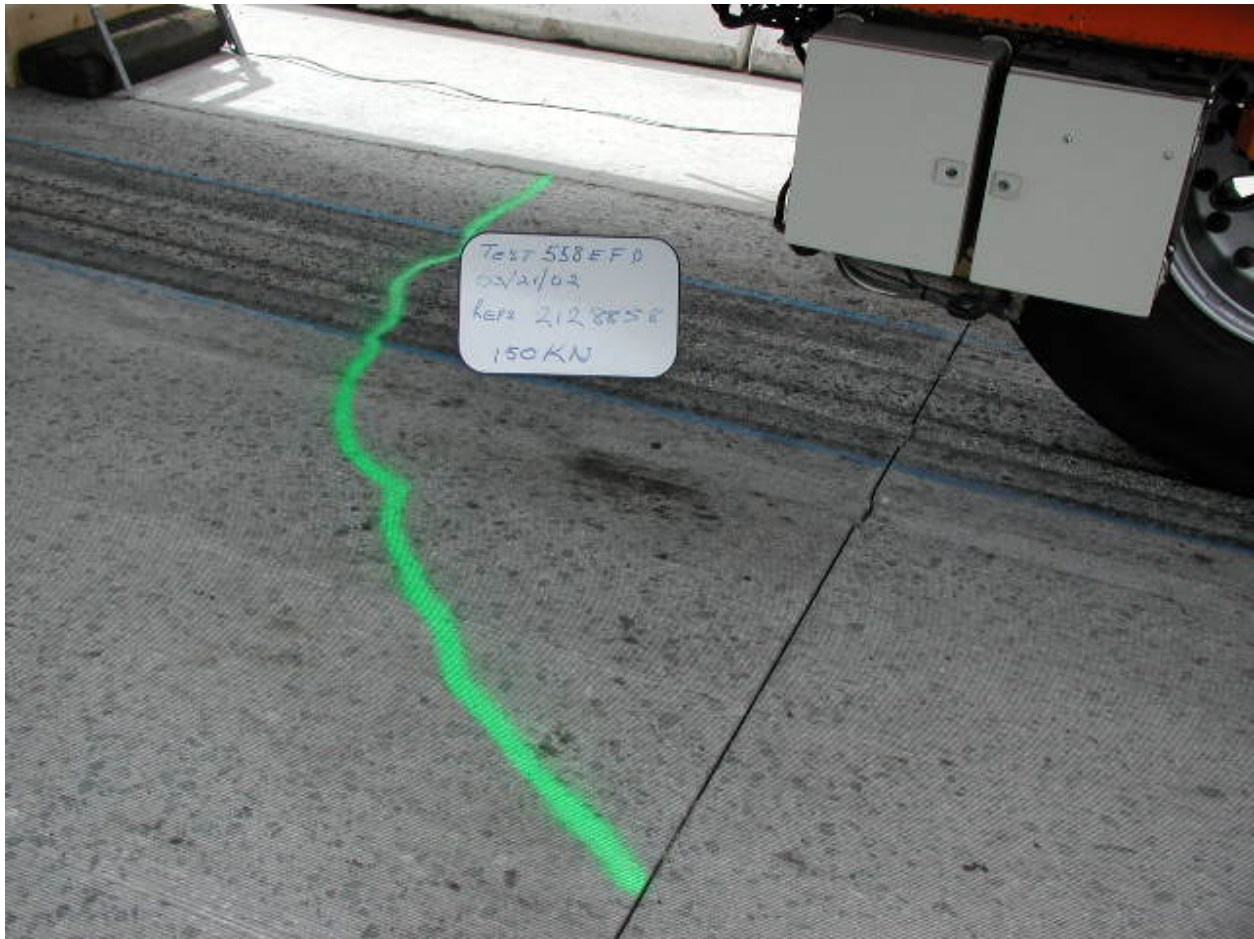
Mid-slab transverse cracking in Slab 42 near Joint 42 after 2.129 million repetitions.
